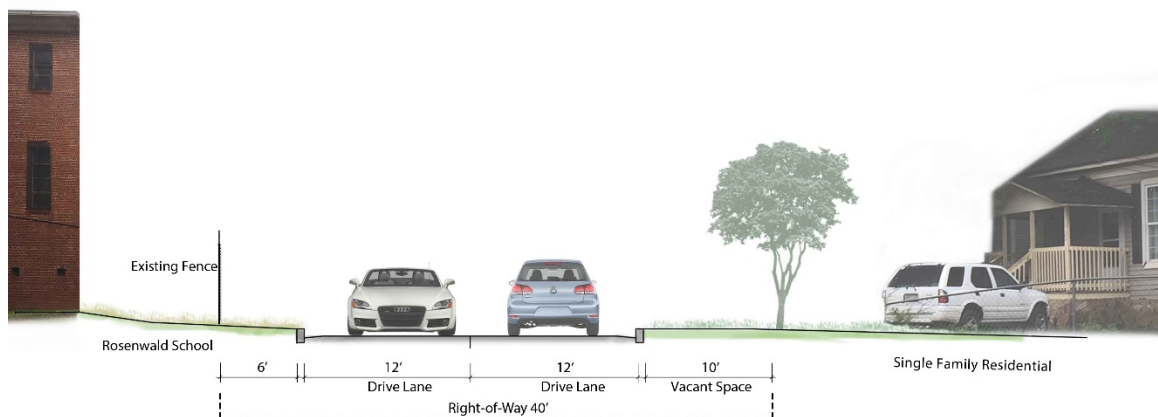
Section E-E – Existing Street Cross Section (By author)
